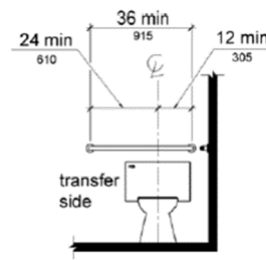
Rear Wall Grab Bar at Water Closets
